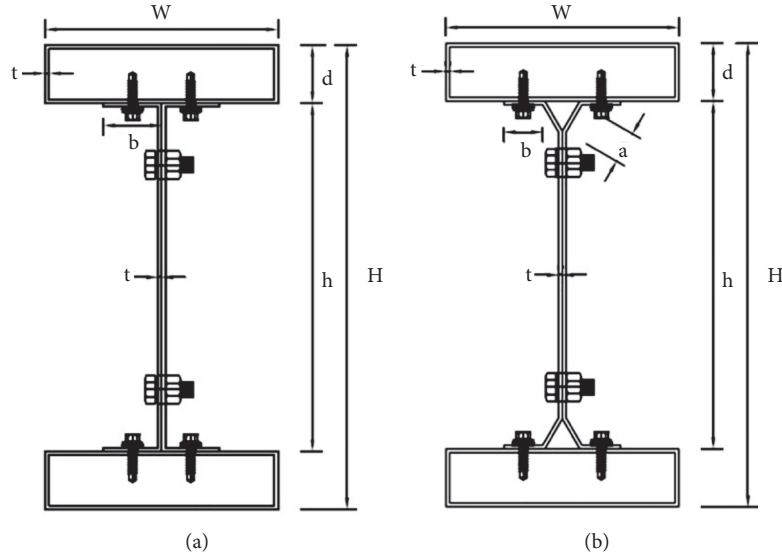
Section geometries: (a) unstiffened beam section; (b) stiffened beam section.
